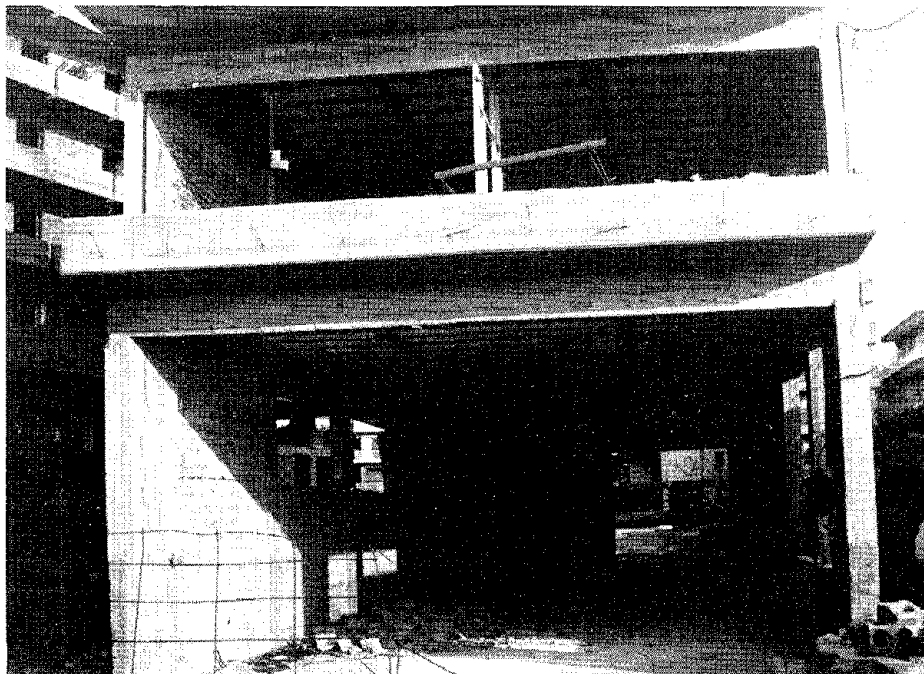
Difference in stiffness of framing and walls in orthogonal directions. The first story is flexible in one direction.
